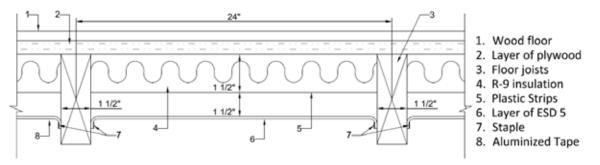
crawlspace assembly 2D, R18.5, Climate Zone 1-2
